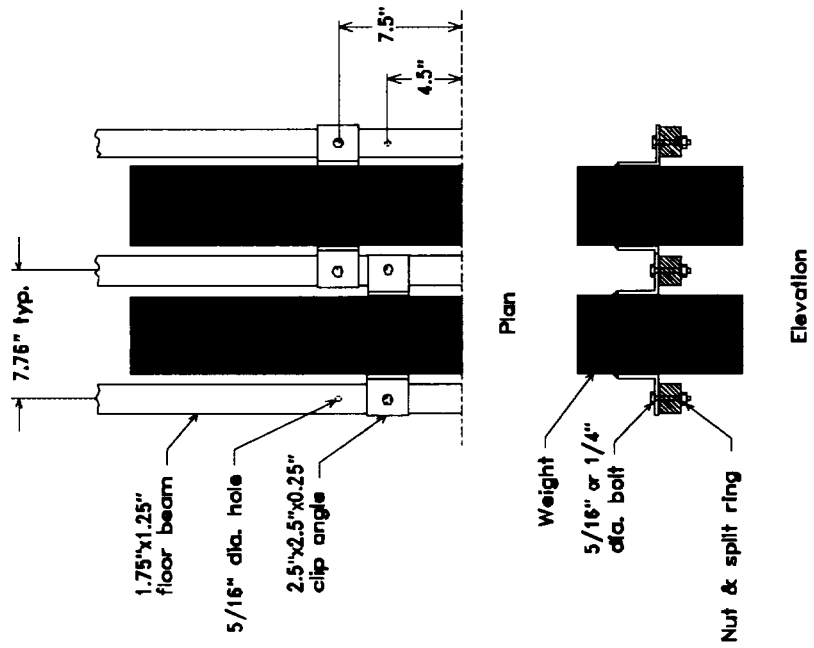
Plan and Elevation Details of Weight to Floor Beam Connection
